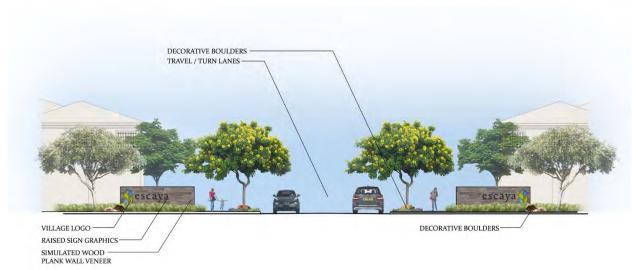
Secondary Village Entry Concept Plan (Avenida Seneca @ Main Street)
